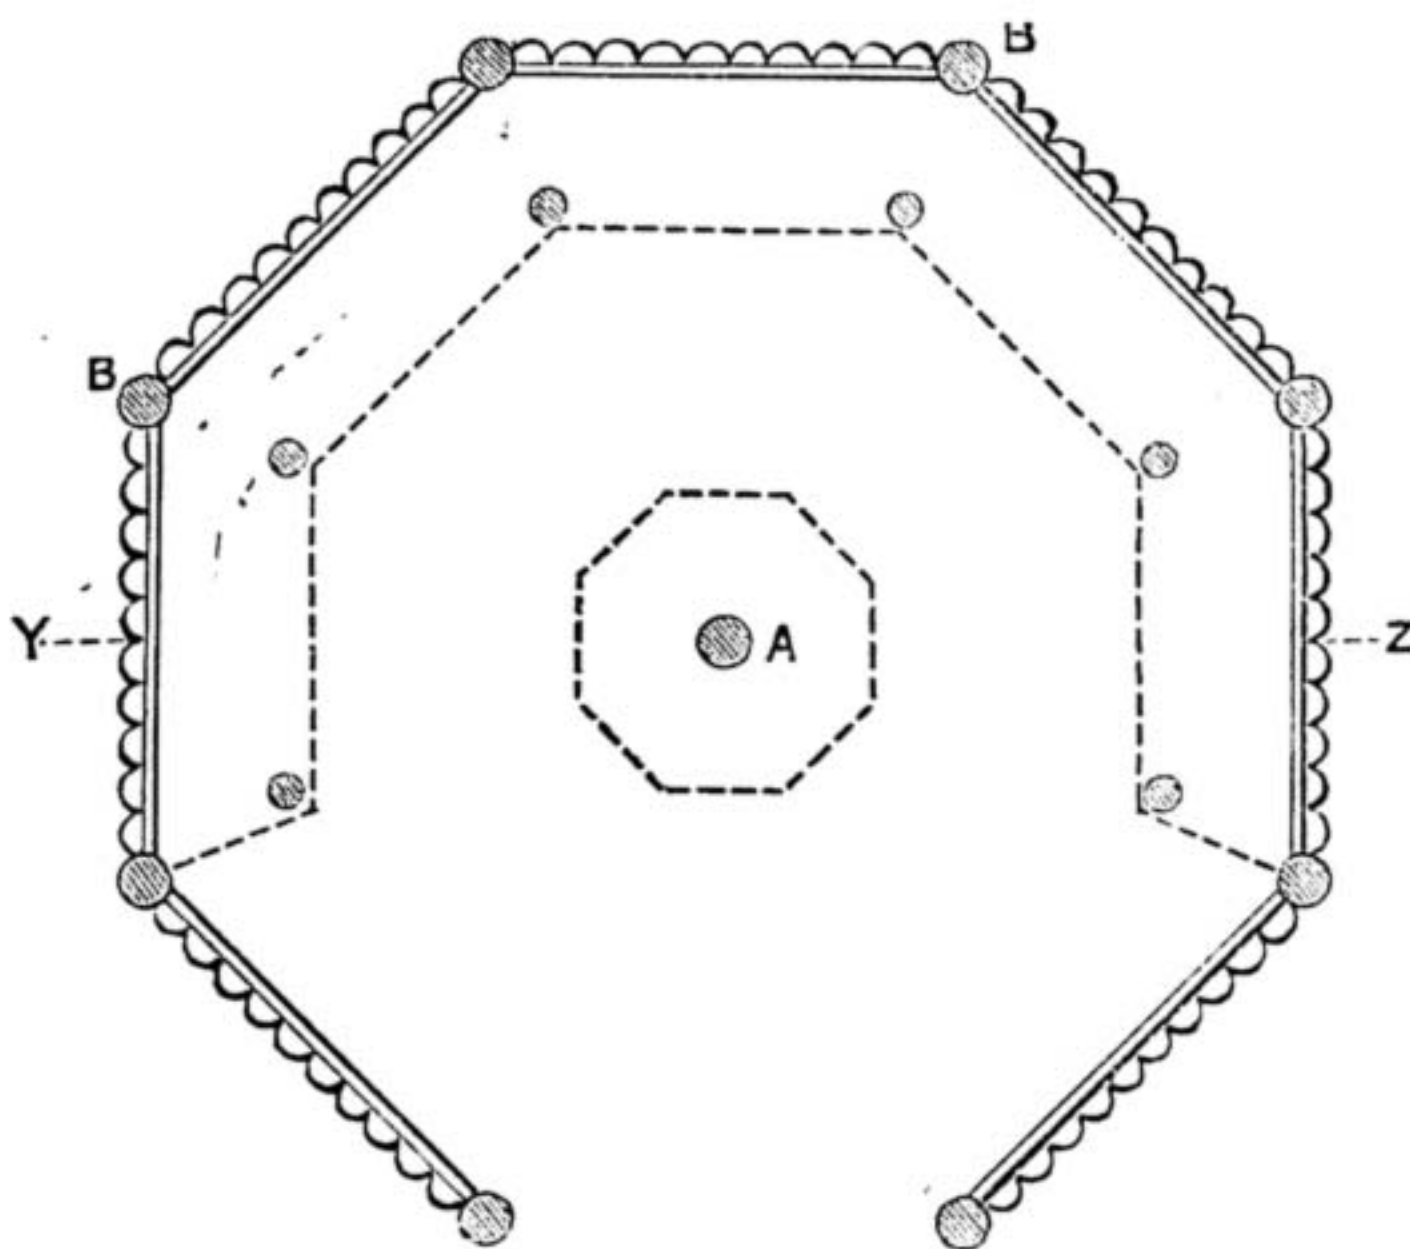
Ground Plan of Summer-House (1/2 in. scale).
